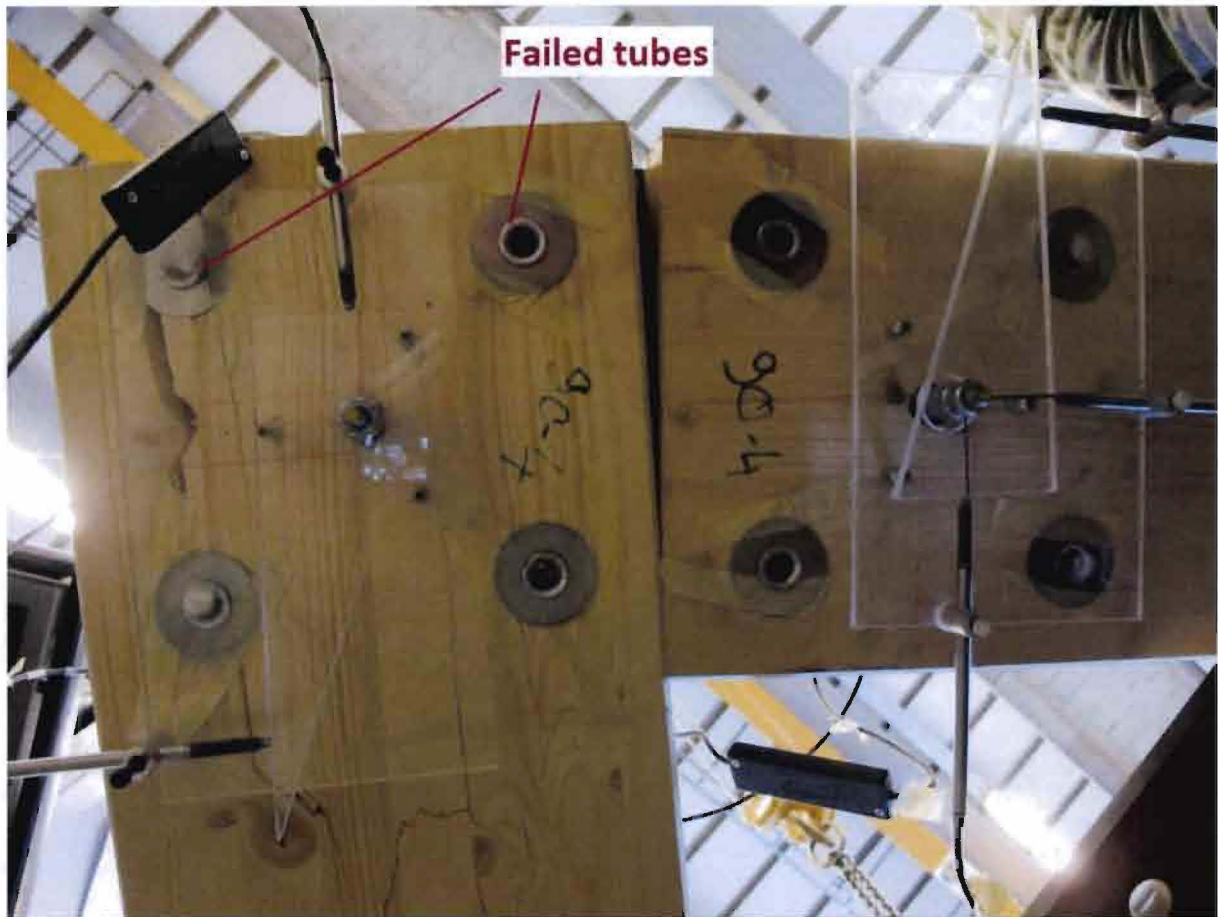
Failed connection (sample 90-4) Timber failed after failure of two tubes
